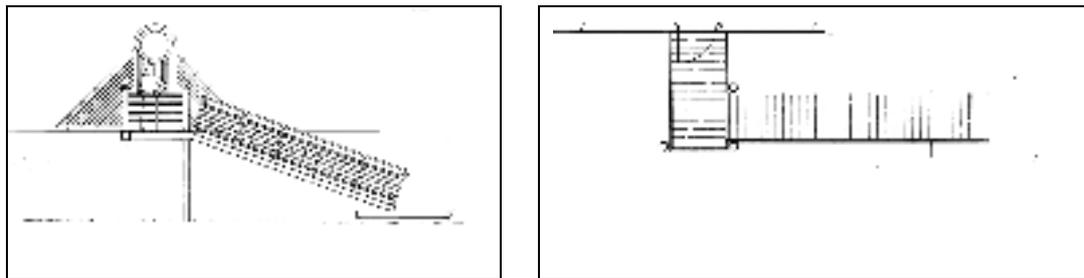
Elevation and plan of entrance gateway and access arrangements too floating jetties at Limehouse Basin. The boats are moored on finger jetties with a single gated point of access, forming a private zone and allowing the water to act as a moat to secure the boats.
